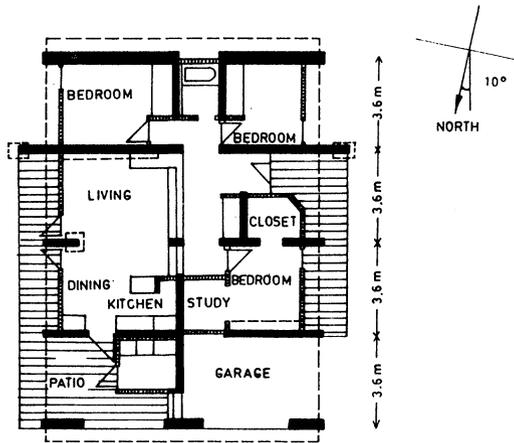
FLOOR PLAN OF ATASCADERO, CALIFORNIA 'SKYTHERM' HOUSE
